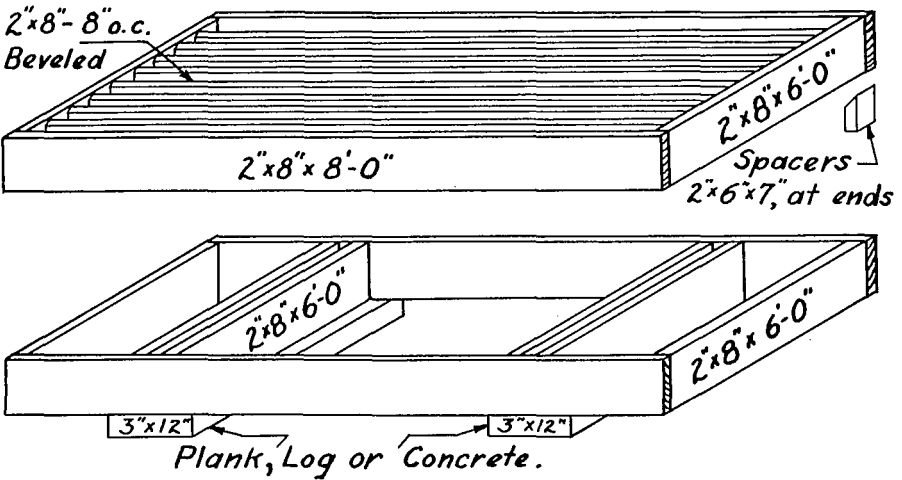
This cattle or sheep guard set in a road leading to pastures allows a vehicle to pass over without opening gates but will keep the sheep in. Top section rests on bottom section.
